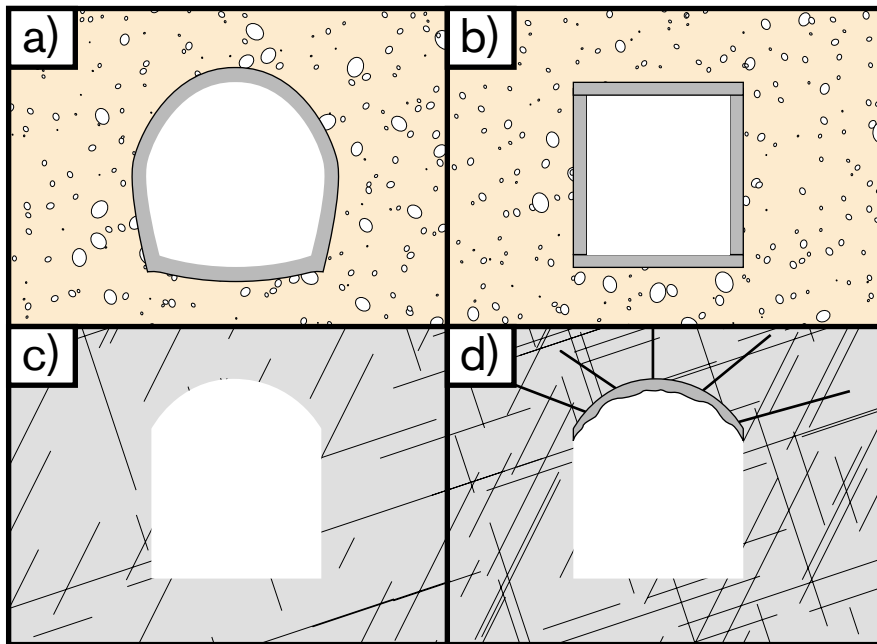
Types of tunnels in this report a) tunnel lined with concrete b) cut-and-cover tunnel c) unlined tunnel d) unlined tunnel with rock bolts and shotcrete (concrete that is sprayed on the tunnel walls).
